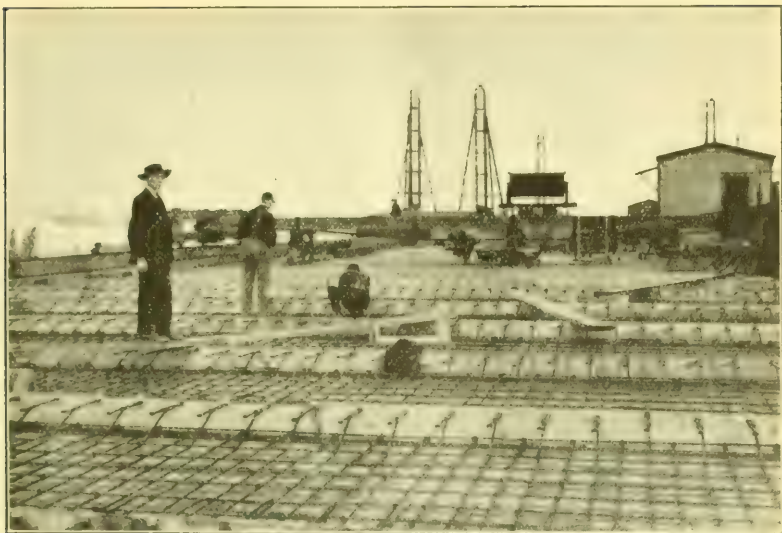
TENSION AND DISTRIBUTING REINFORCEMENT WITH TEMPLATES FOR HOLDING IN POSITION.
